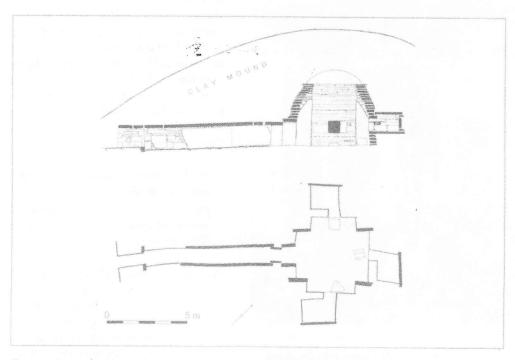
An elevation and plan of Maeshowe (after RCAHMS 1946, 308).
